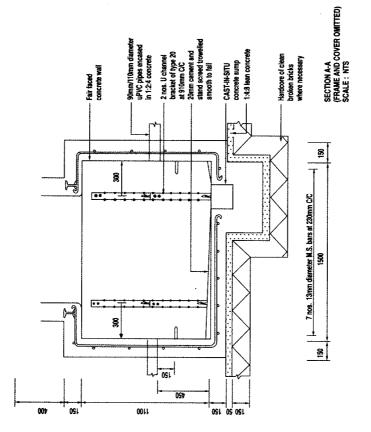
MANHOLE DRAWINGS - TYPE MX1
